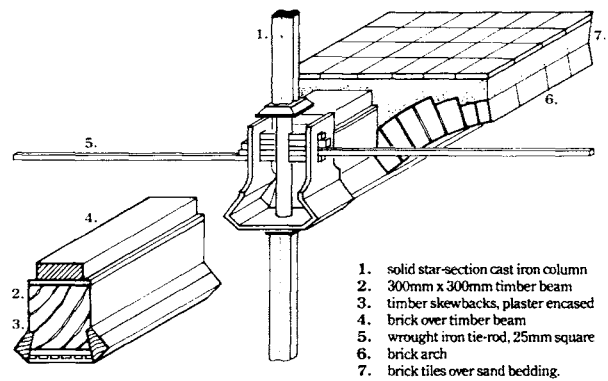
Strutt's use of wooden beams and brick arches with cast iron columns. Courtesy Alan Ogg: Architecture in Steel.
